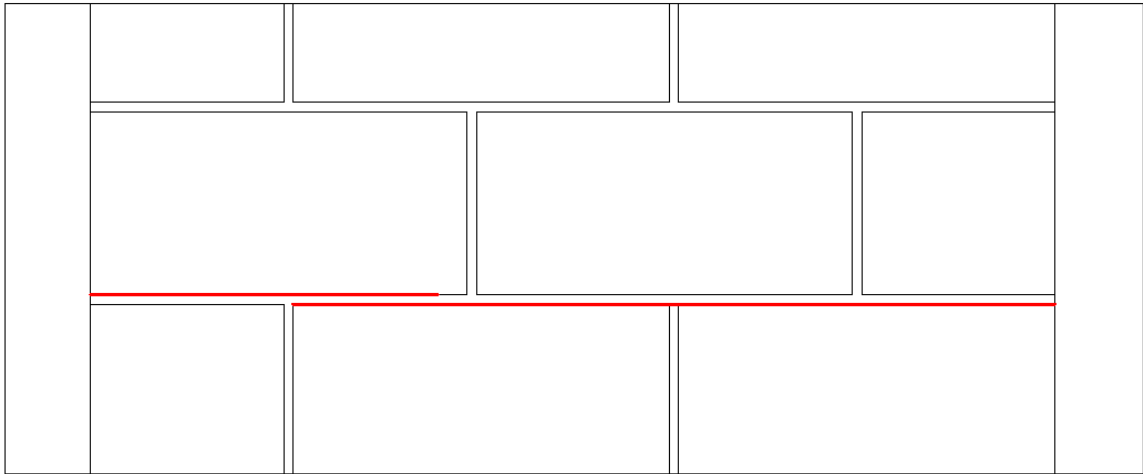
Close-up of Crack Pattern of Unreinforced 3m Control Wall
